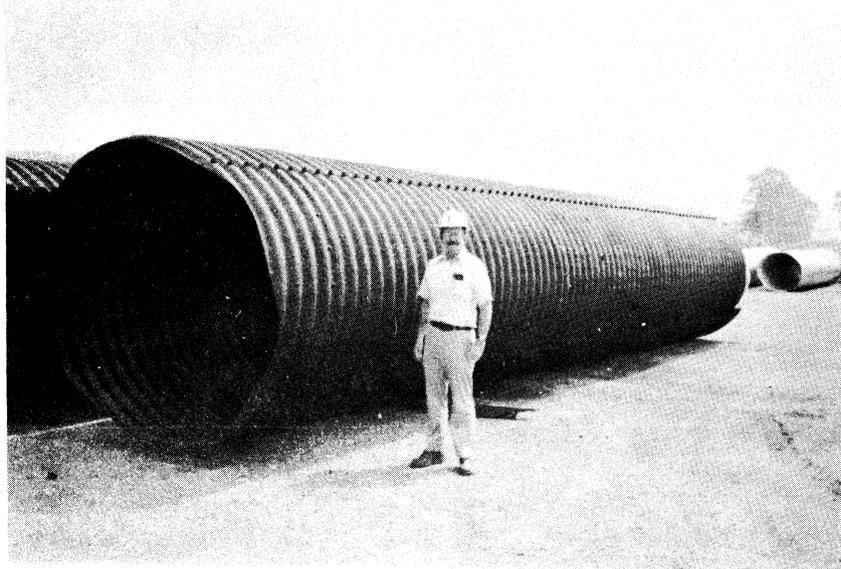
Structural plate pipe assembled and coated at plant in lengths suitable for trucking to site.
